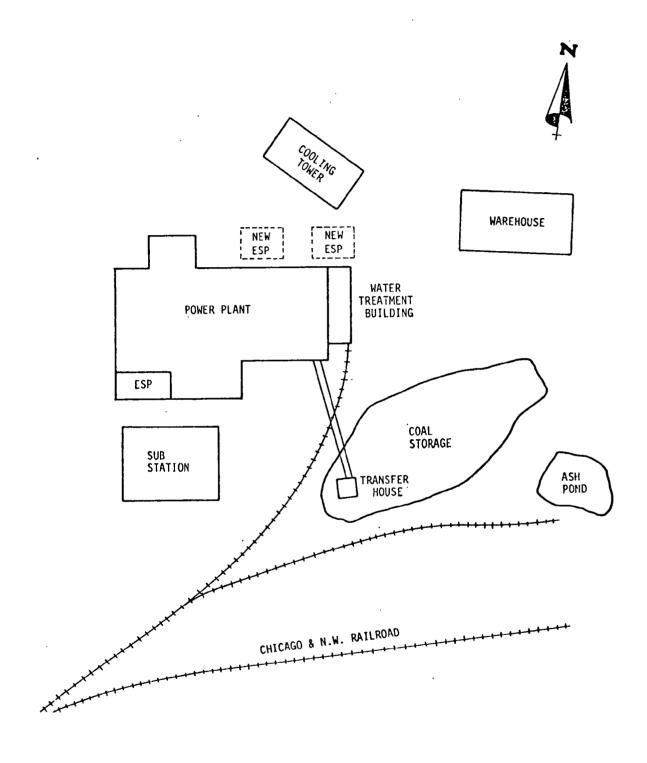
Site plan showing possible locations of new ESP's for Boilers 6 and 7 at the L.D. Wright power plant.
